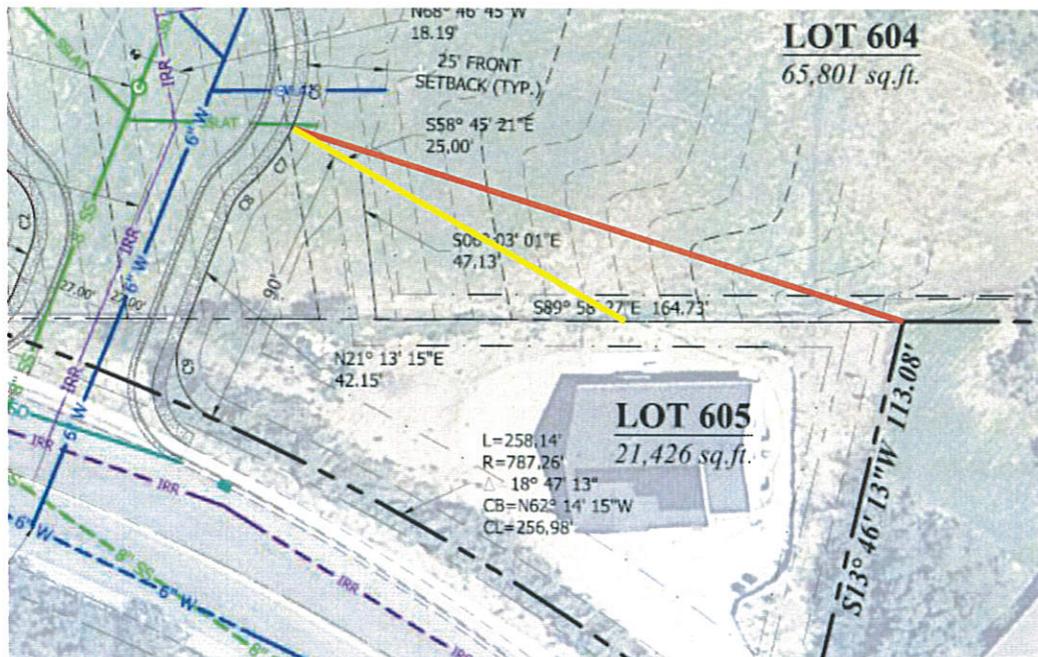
Alternate configurations of Lots 604 and 605 which meet corner lot frontage requirements.
